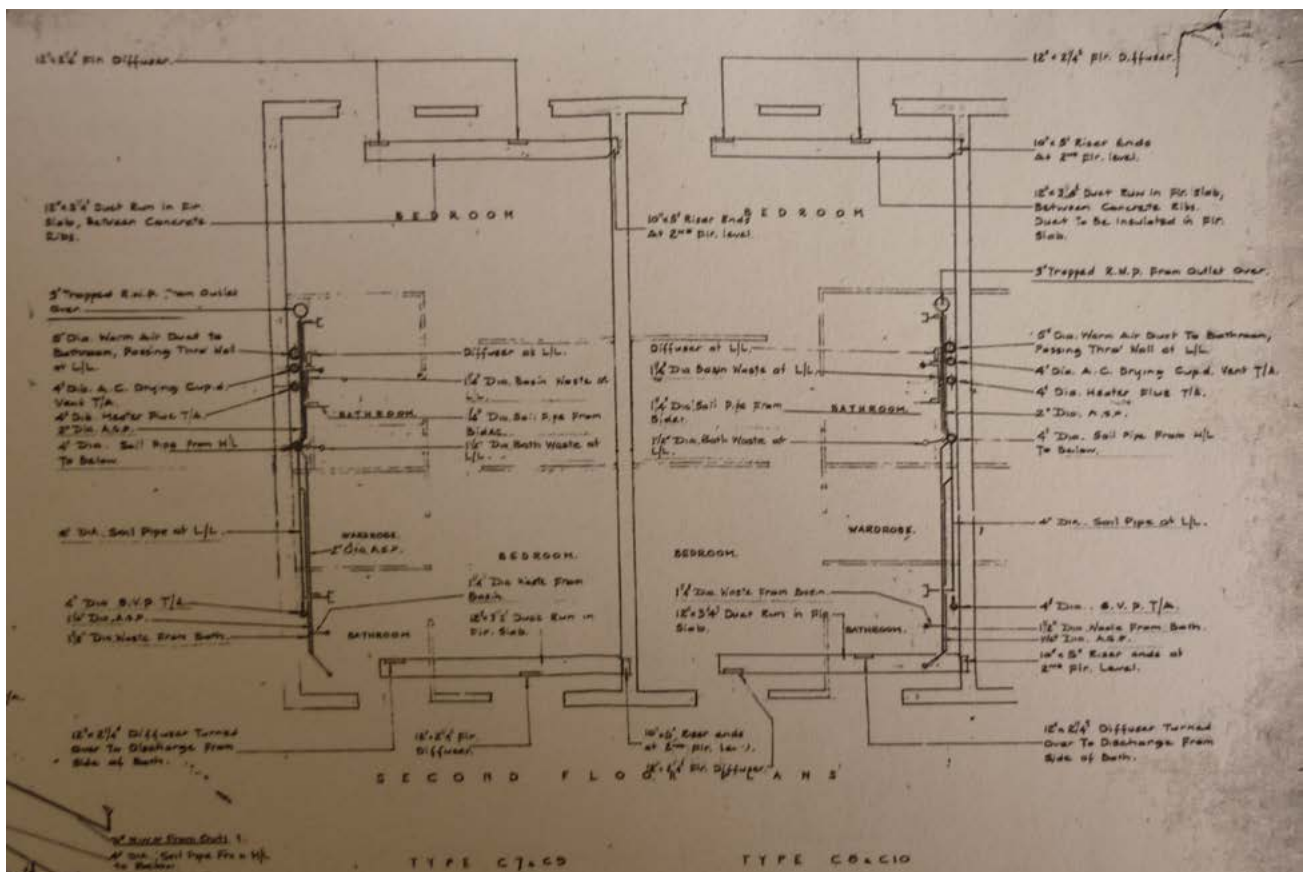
Plans of House Types C for Phase I and II. 1966. Camden Local Archive
